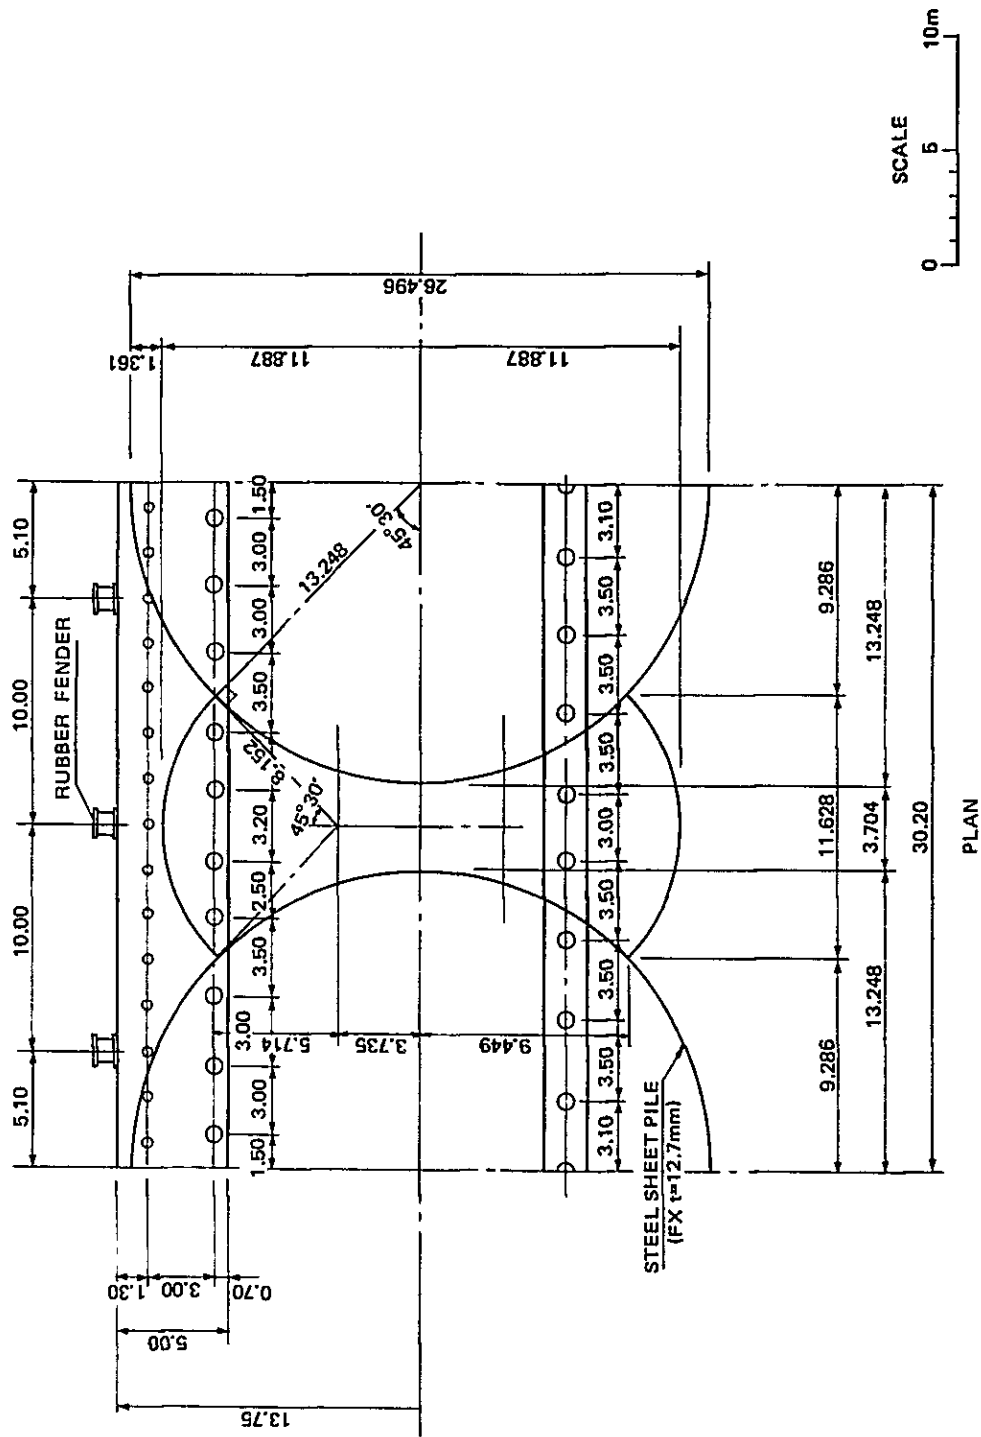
Container Berth Quay Wall (Steel Sheet Pile Cellular Cofferdom Type)
